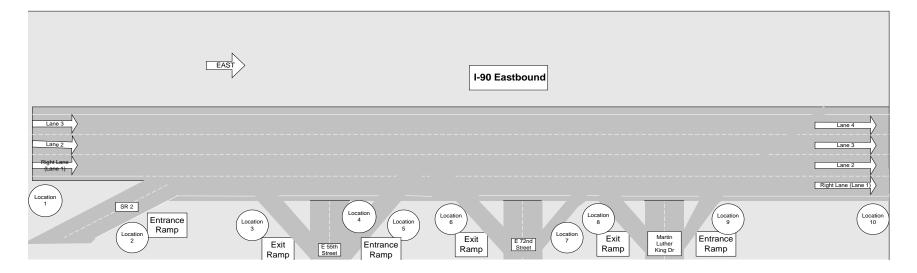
Drawing of Trailer Locations on I-90 Eastbound after Construction
